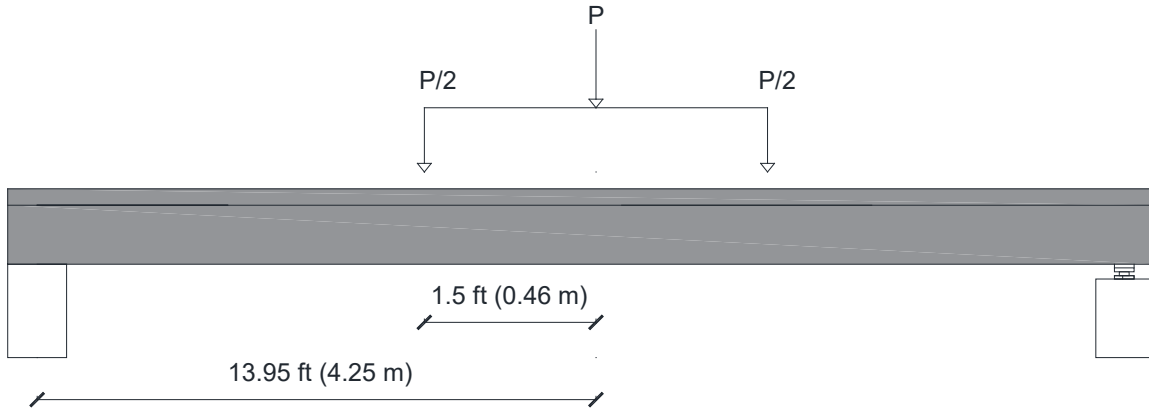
Applied Load Configuration for 30-ft Long Girder in Strength Test
